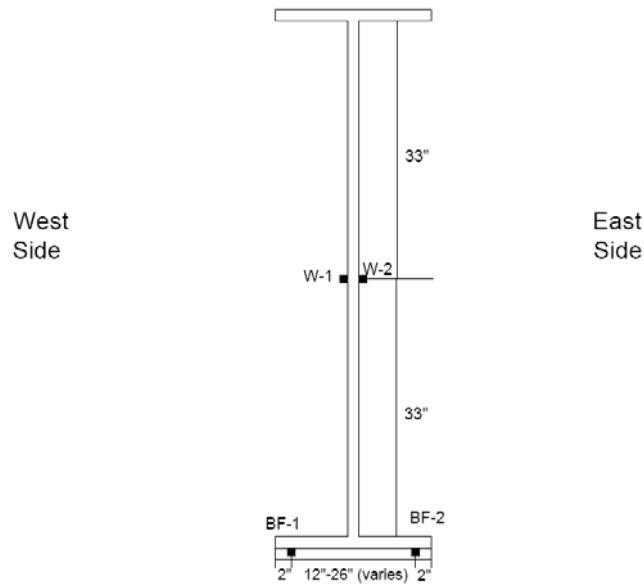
Girder Strain Gauges Cross-Section Labeling System, SR 1 Over US-13
